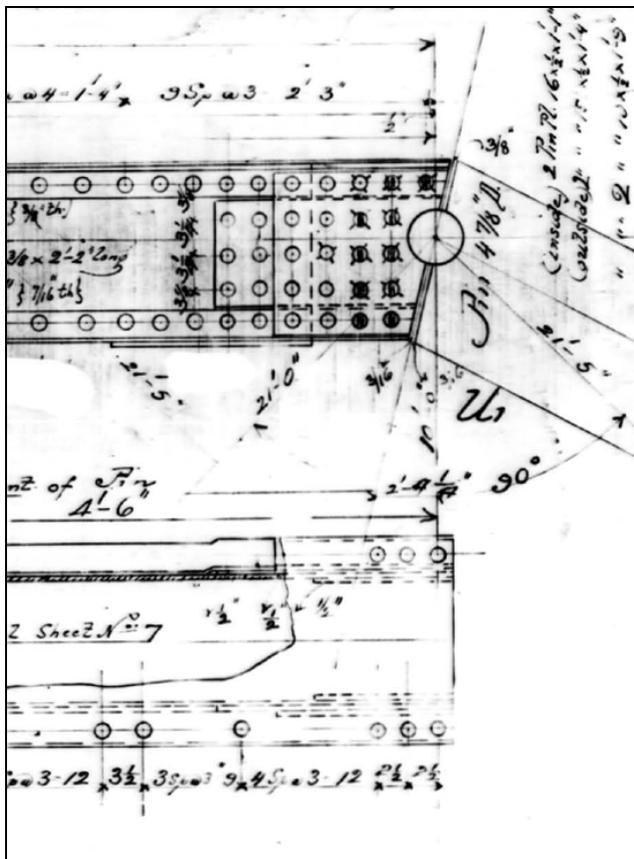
An excerpt from the as-constructed drawing showing a typical upper pinned connection. This shows a bearing connection detail was used. This detail does not accommodate the transfer of tension across the joint.
